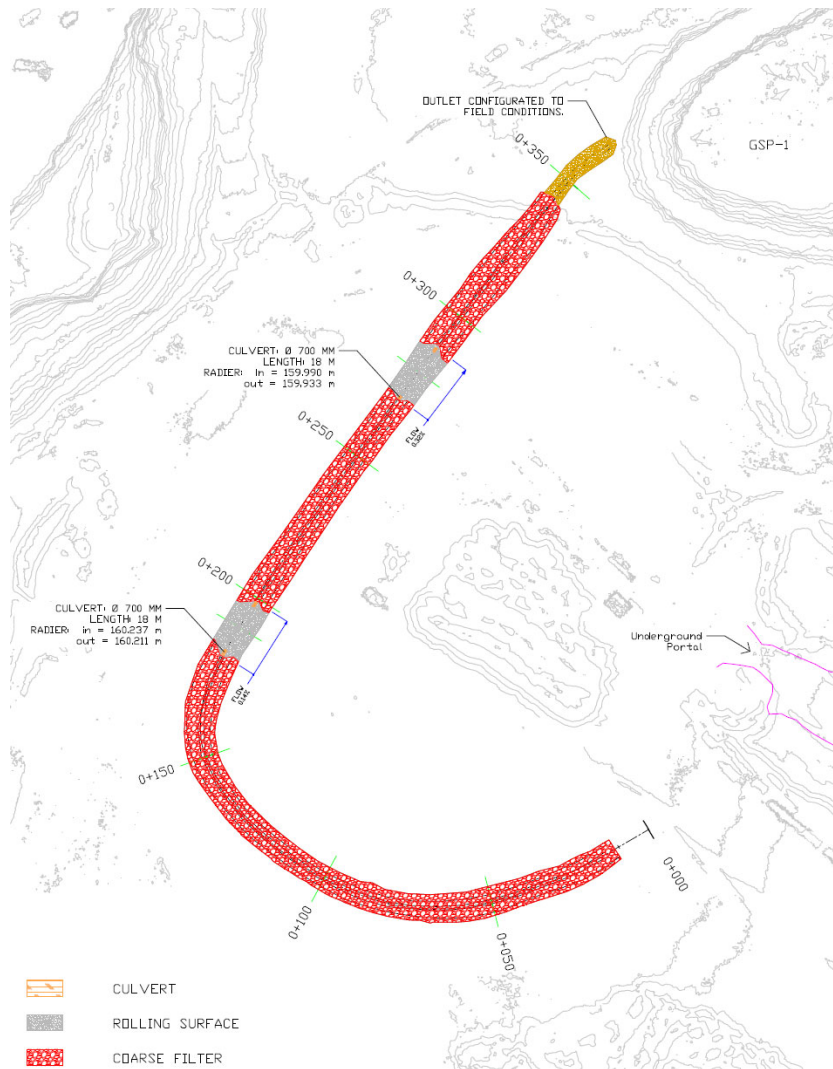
Plan View of Underground Ore Stockpile Saline Ditch
